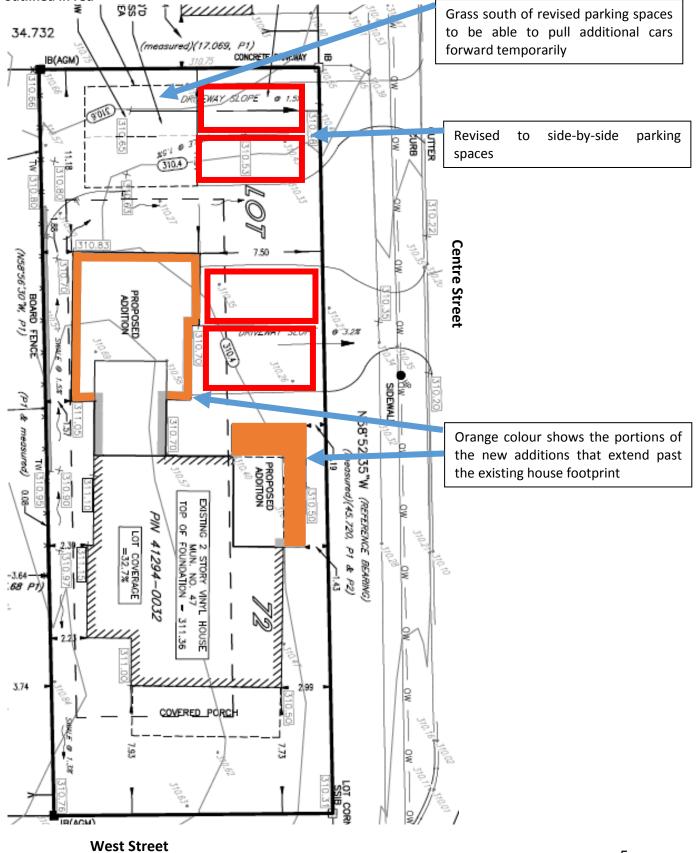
Revised site plan showing the existing house and proposed additions and parking spaces outlined in red
